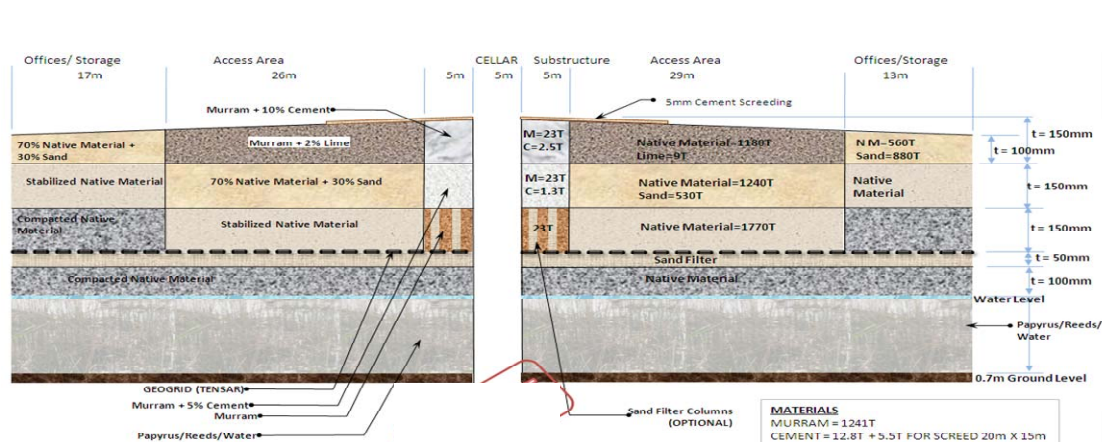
Typical Cross-section of the drilling rig pads foundation employing OPMC and geogrid reinforcement
